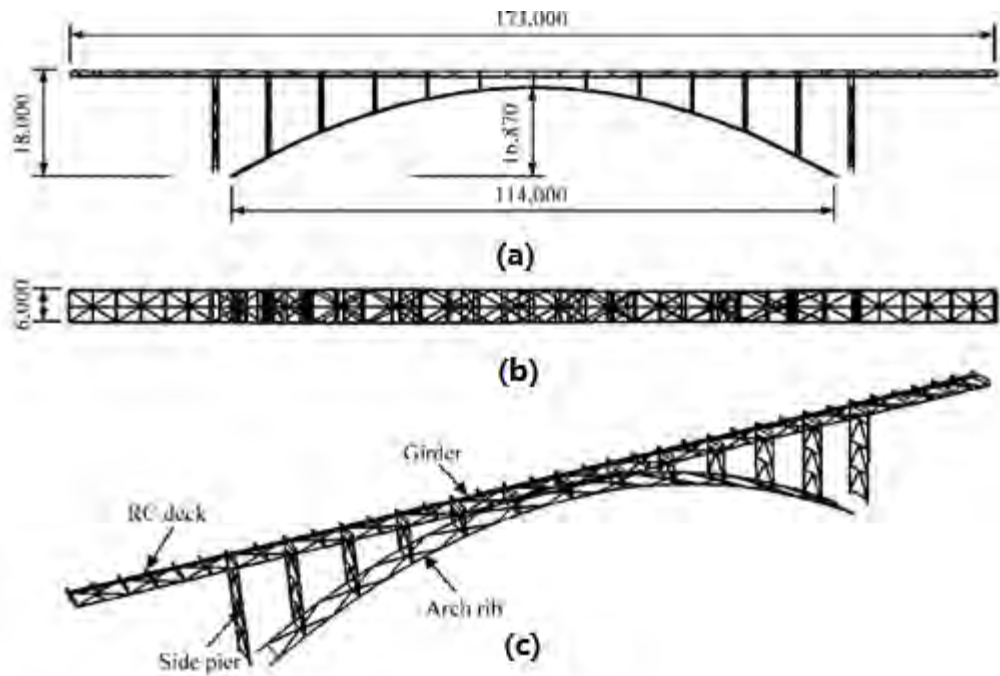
Layout of the Steel Arch Bridge to be retrofitted: (a) Elevation; (b) Plan; and (c) 3-D View (Usami et al., 2005) (Unit:mm) (Usami et al., 2005)
